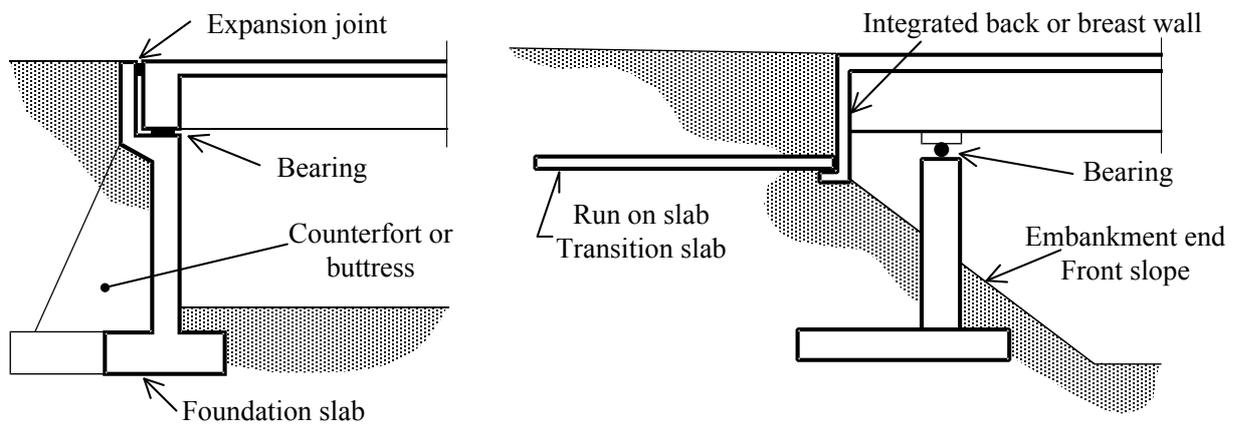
Notations for abutment elements in an ordinary bridge and in an integral bridge with integrated back walls.
